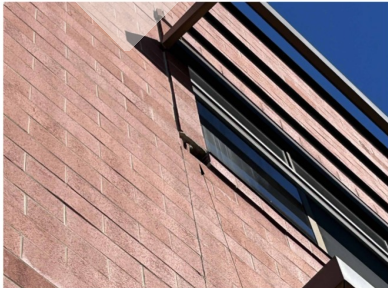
MASONRY FAILURE LOCATED AT WINDOW SILL. SEE PHOTOS #5 & #6.
